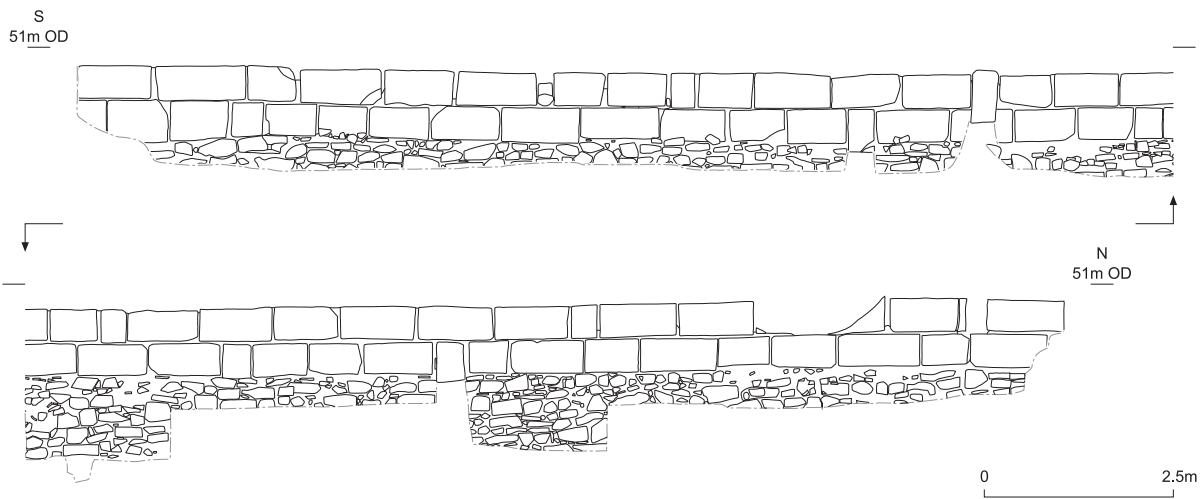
Elevation of the eastern face of the barge quay and masonry abutment (S9) (scale 1:100)
